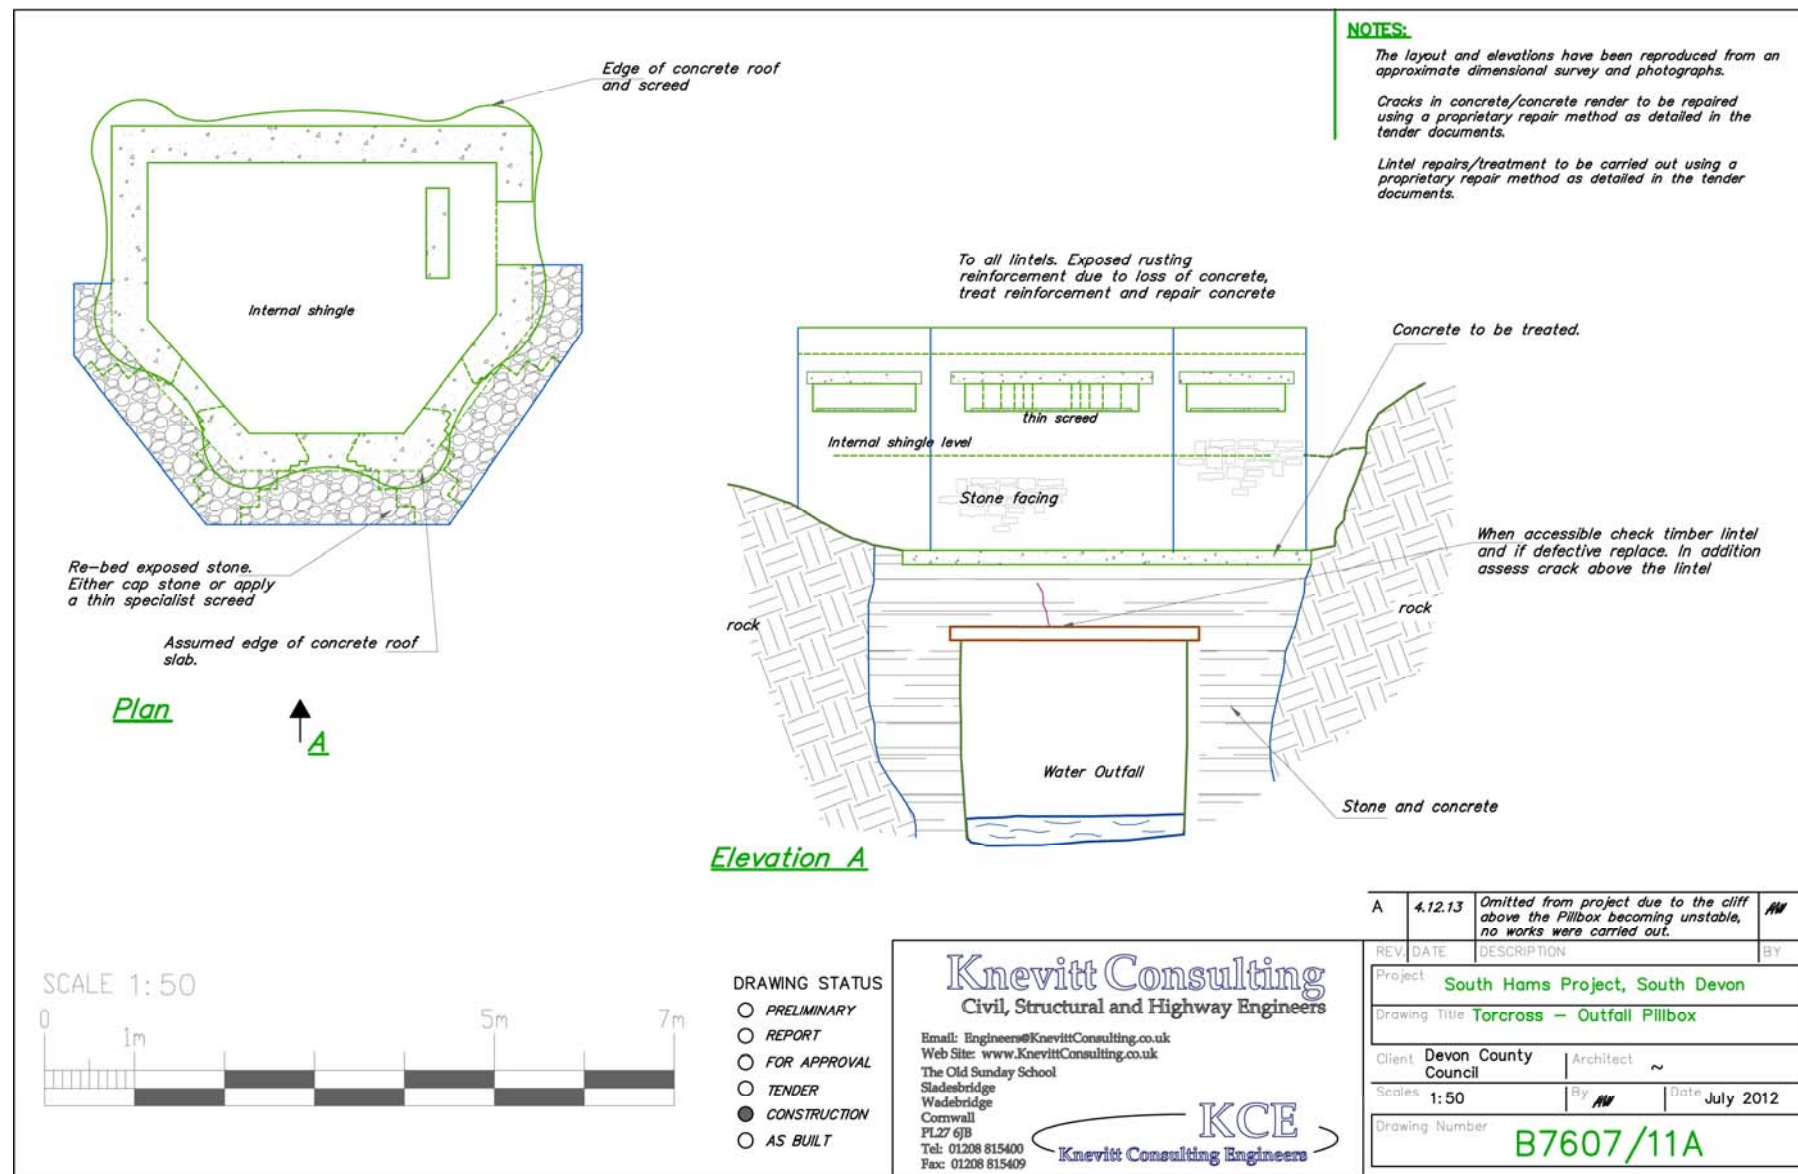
Survey plan and elevation of the Outflow pillbox before works © Knevitts 4/12/13.
